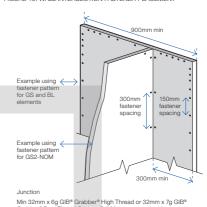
WALL INTERSECTION FASTENER PLACEMENT
